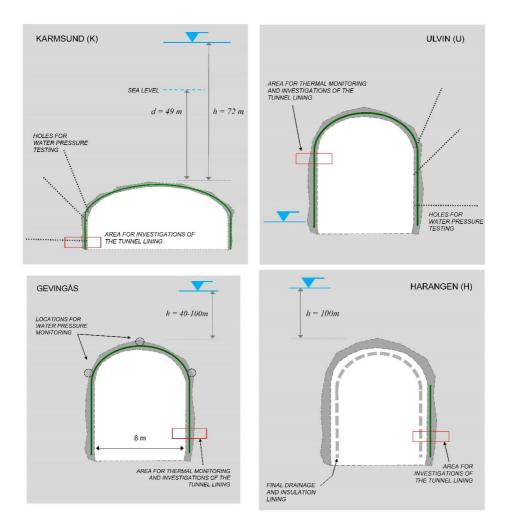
Conceptual cross sections of the four tunnel test sites, illustrating layout of lining structure, hydrogeological context and location of executed investigations
